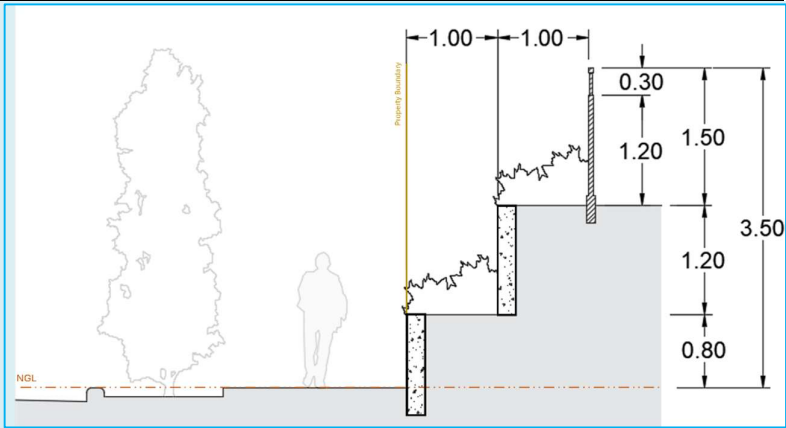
(dii) Retaining wall and fence height - two steps
